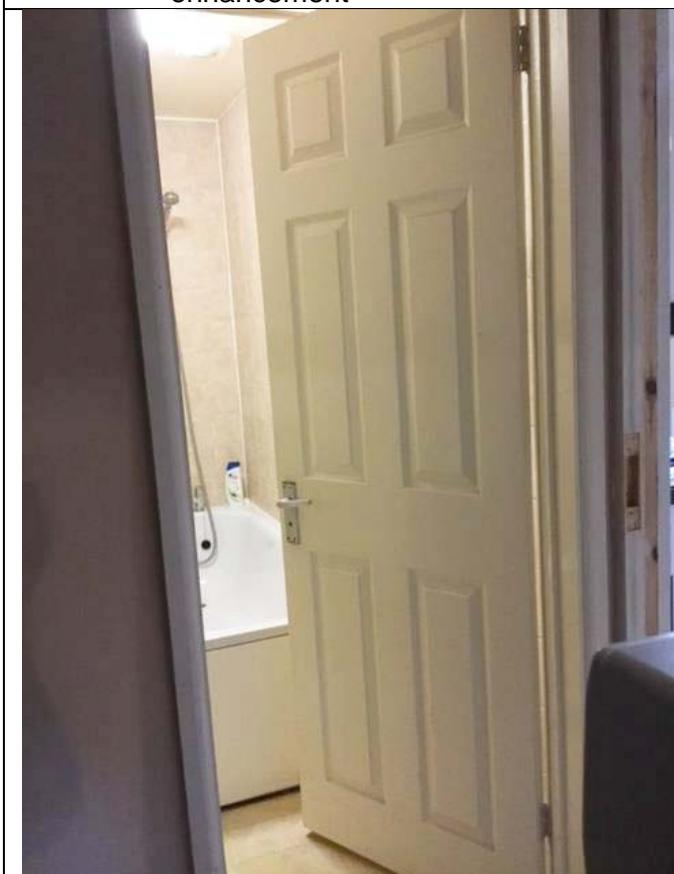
Modern generic faux Georgian six-panel door to first floor bathroom
